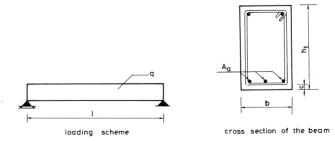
Loading arrangement and cross-section of the concrete beam.
